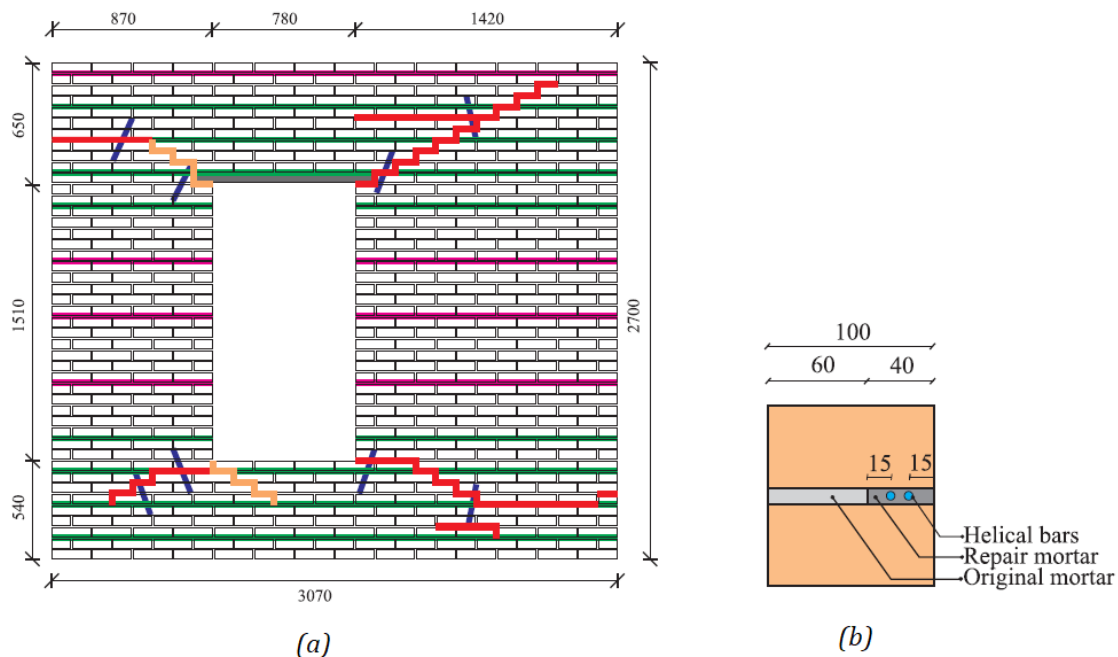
(a) Geometry of strengthened wall (TUD_COMP-45) with locations of pre-/ post- damage and lay-out reinforcements; (b) cross-section reinforced bed-joint (Drougkas et al., 2020)
